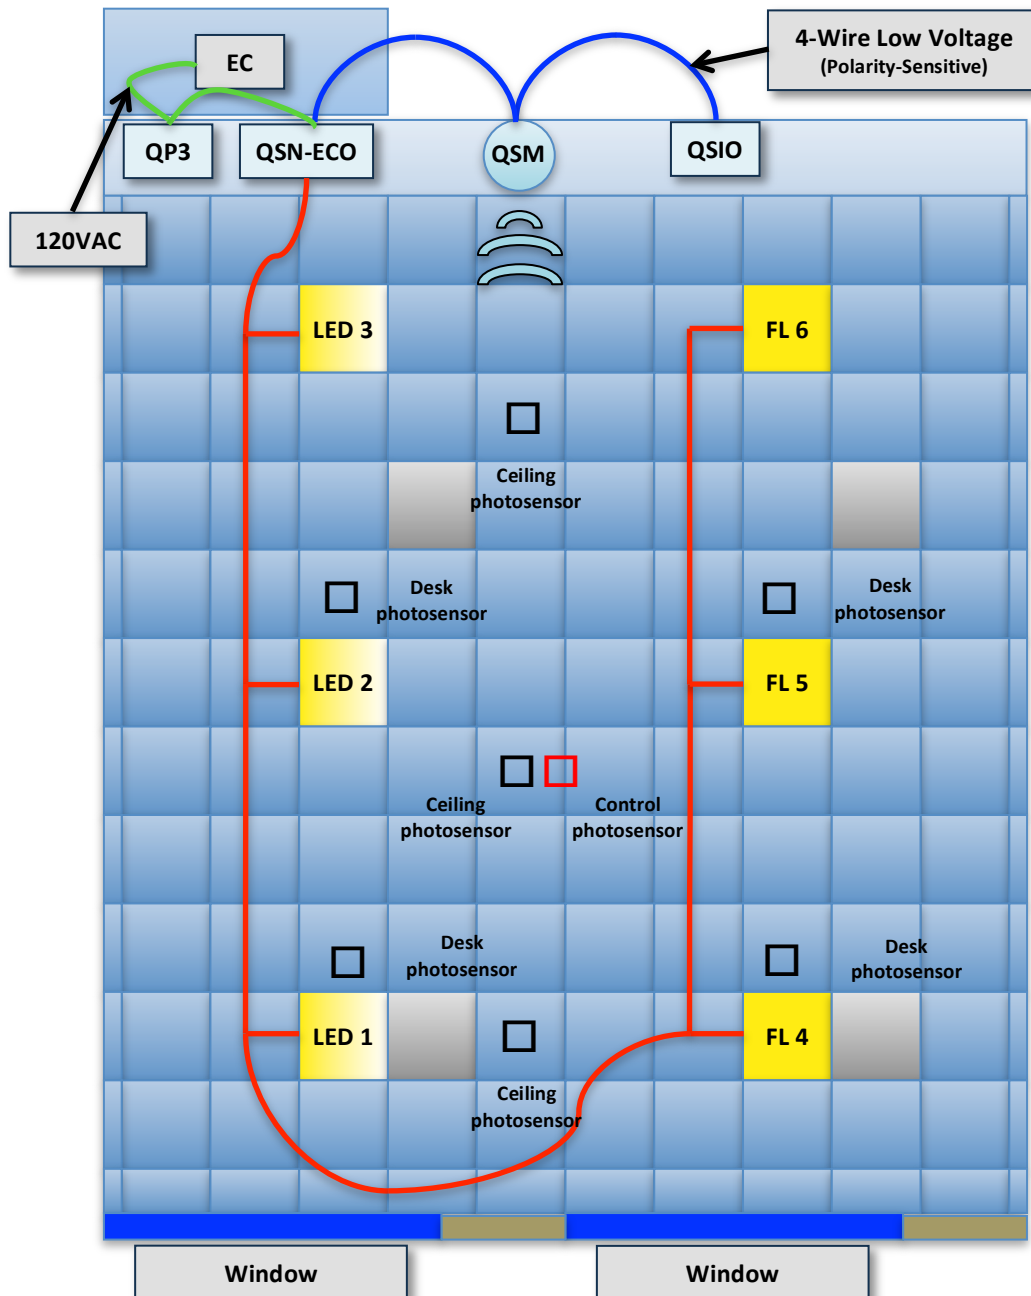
Schematic (previous page) and photo (above) of luminaires, lighting controls & photosensors layout during experiment.
